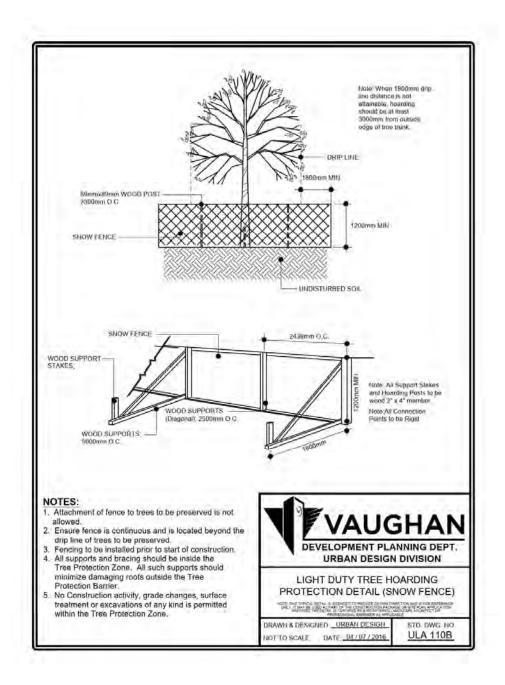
Light Duty Tree Hoarding Protection Detail (Snow Fence)
